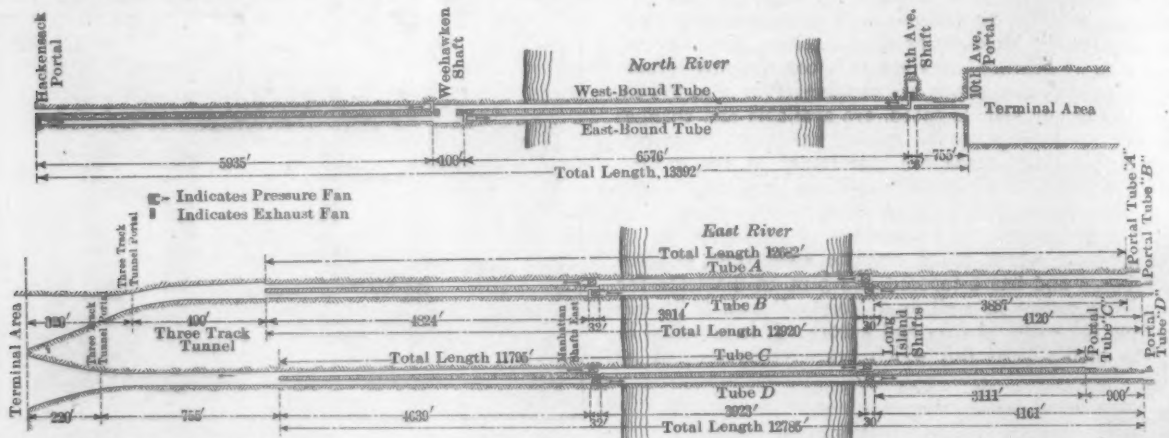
Diagram of the Ventilation System Installed in the Pennsylvania Railroad Tunnels Under the North and East Rivers by the American Blower Company, Detroit, Mich.
